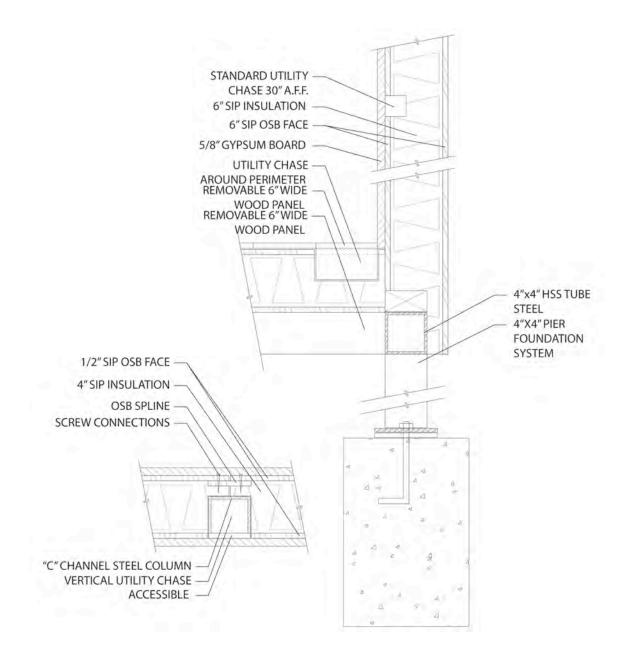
SIP & Steel Frame Wall Detail(s) by Author.
